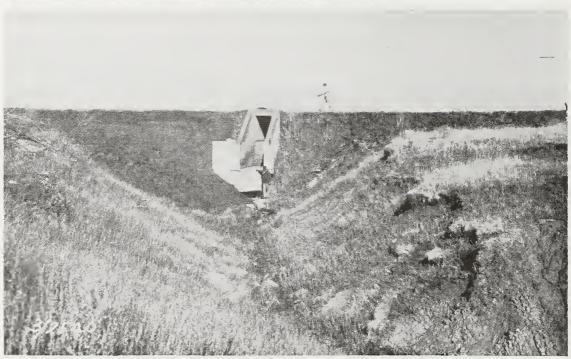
Fill dirt is being placed around a box culvert. Note that the stream channel has eroded more than five feet below the bridge apron. Gully headcut migration has undercut the toe wall and caused one wing wall to fail.
